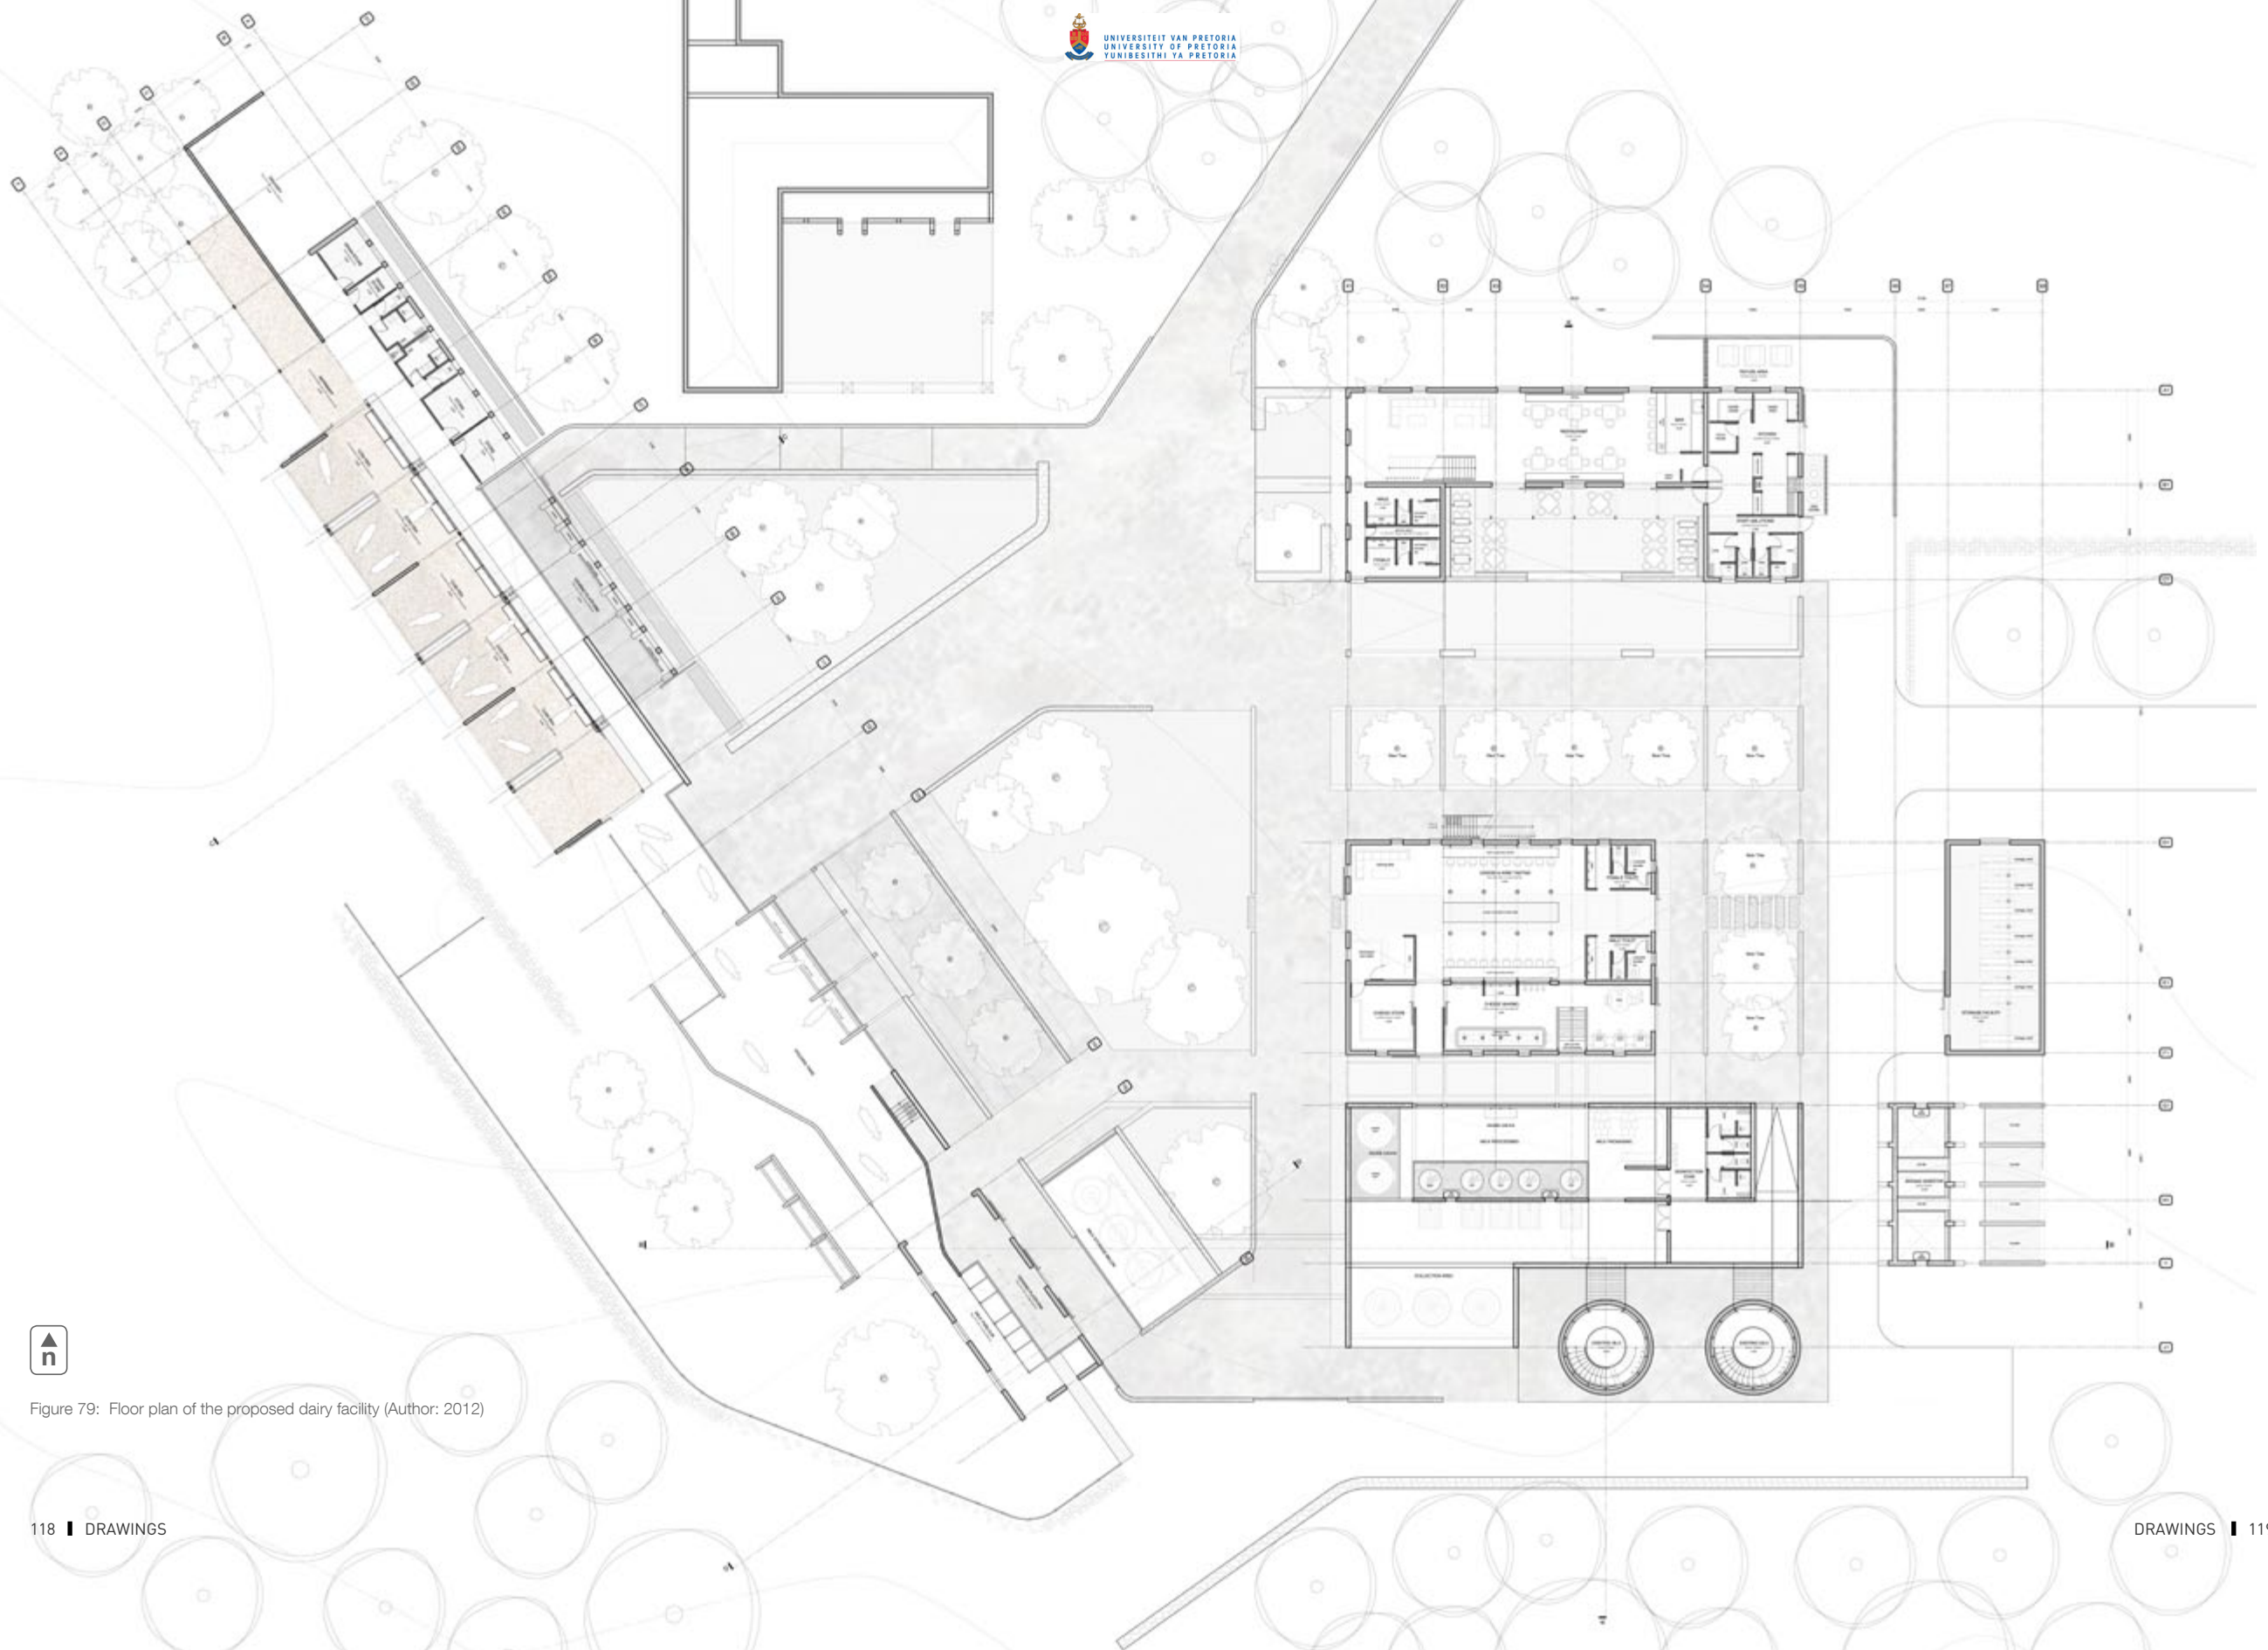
Floor plan of the proposed dairy facility (Author: 2012)
